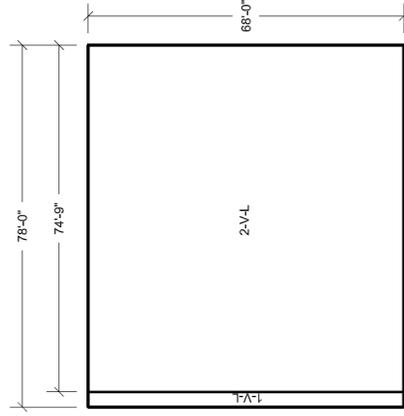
H.6-76: PUMP HOUSE INTERNAL WEST WALL LOOKING WEST
